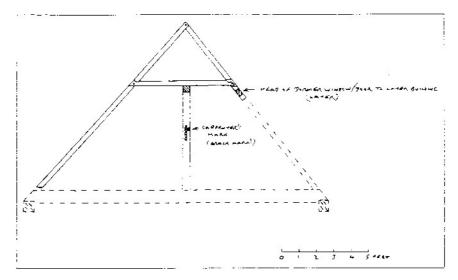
A medieval roof in Head .Srreet. Colchester - Cross-section
